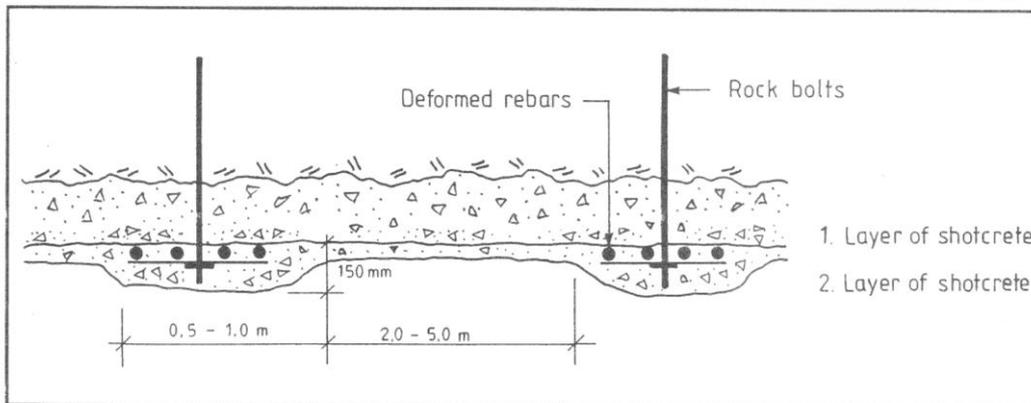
Support with ribs of reinforced shotcrete (RRS)
